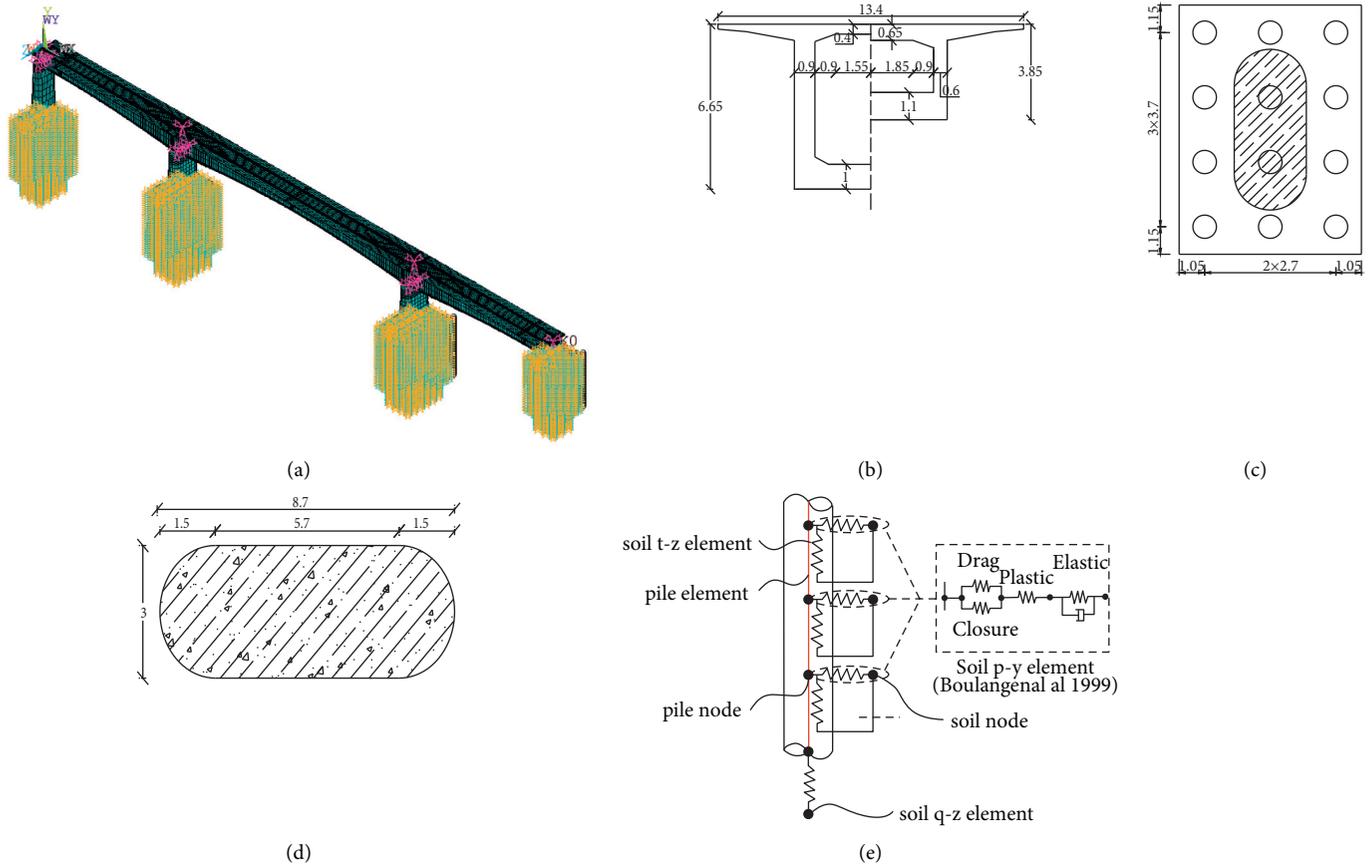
Typical bridge sections. (a) Bridge structure, (b) girder section, (c) bearing section, (d) pier section, and (e) pile-soil interaction model.
